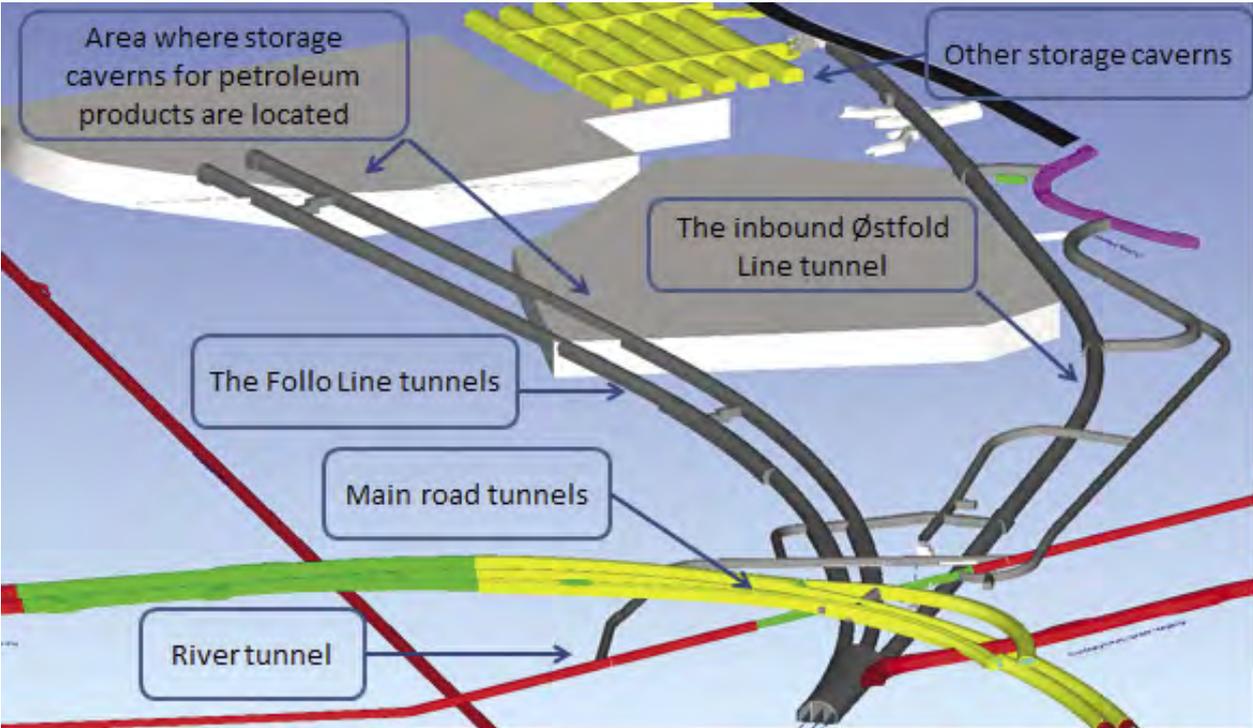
A spaghetti of tunnels in the Ekeberg hill
